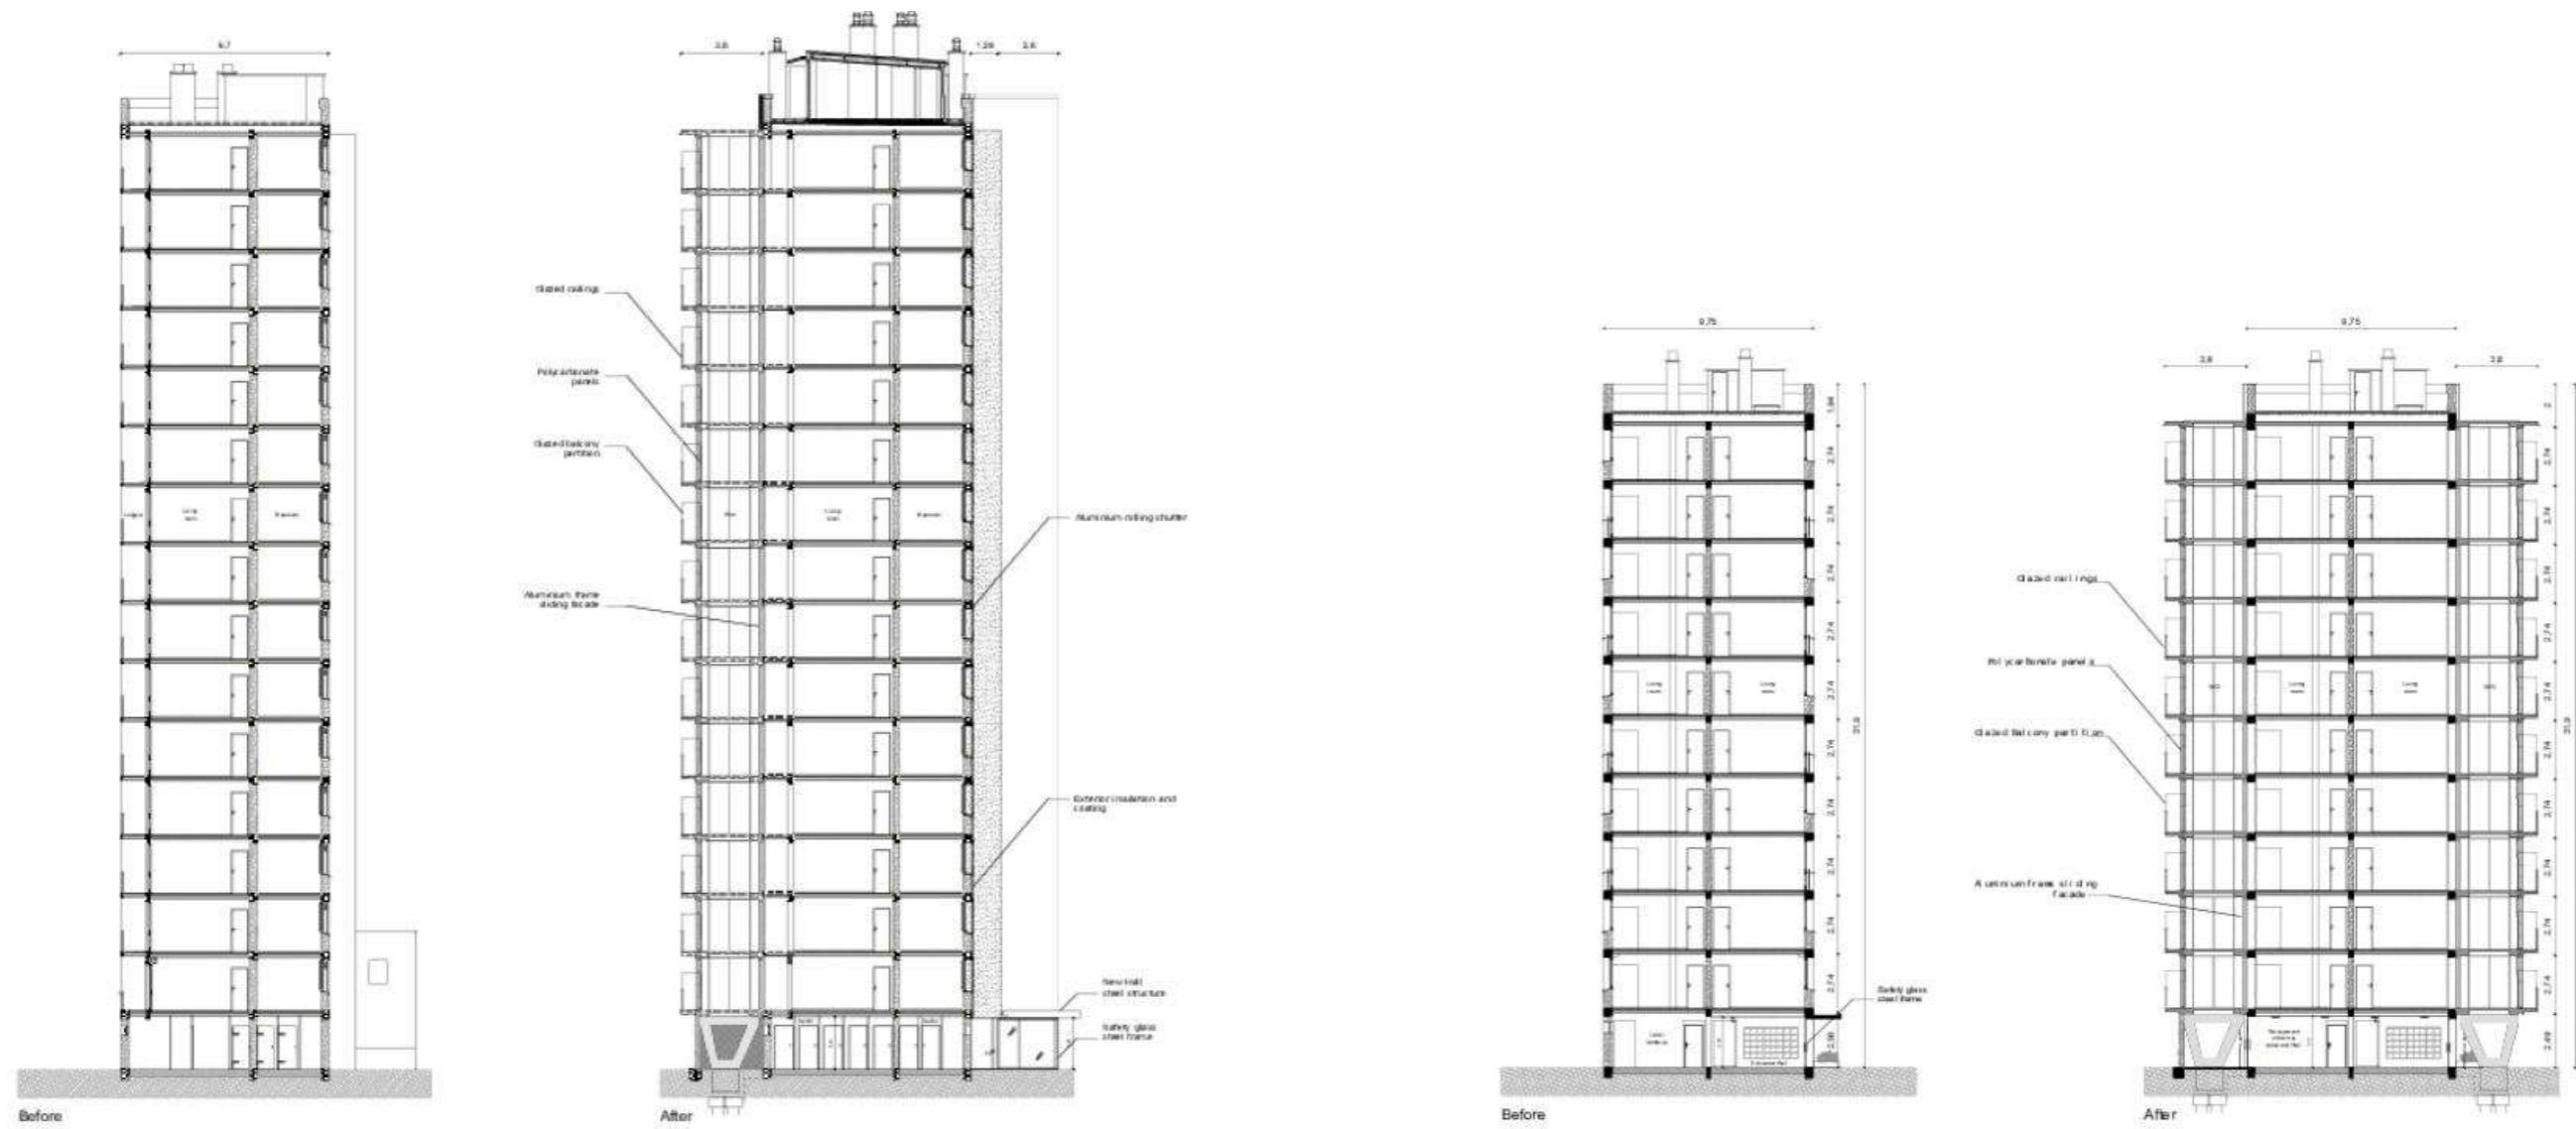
Before and after Section Plans of Buildings H & I (15 stories high), and building G (10 stories high). © Lacaton&Vassal.
